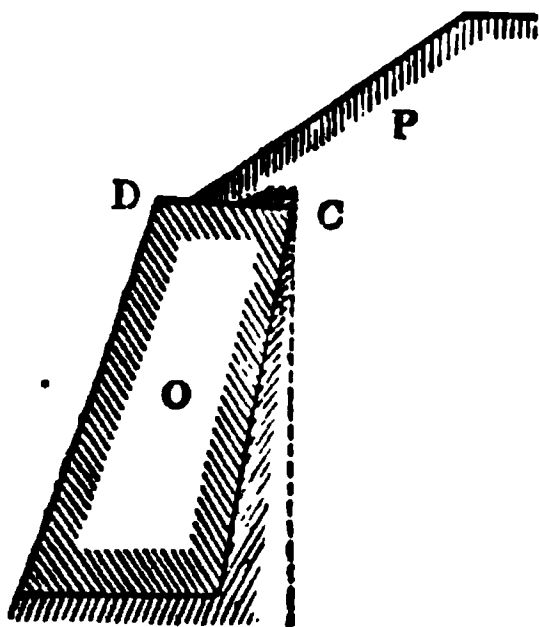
Represents a section O of a leaning retaining wall with a sloping face AD and the back BC counter-sloped.
